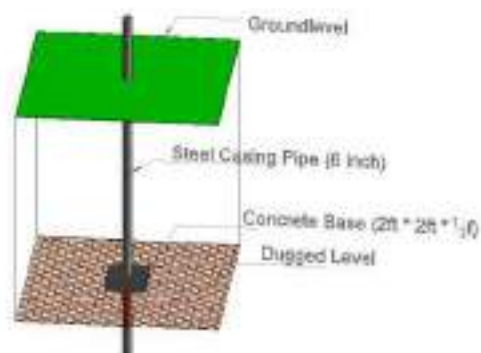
Cross-sectional view of primary filter of pit filtration technique
